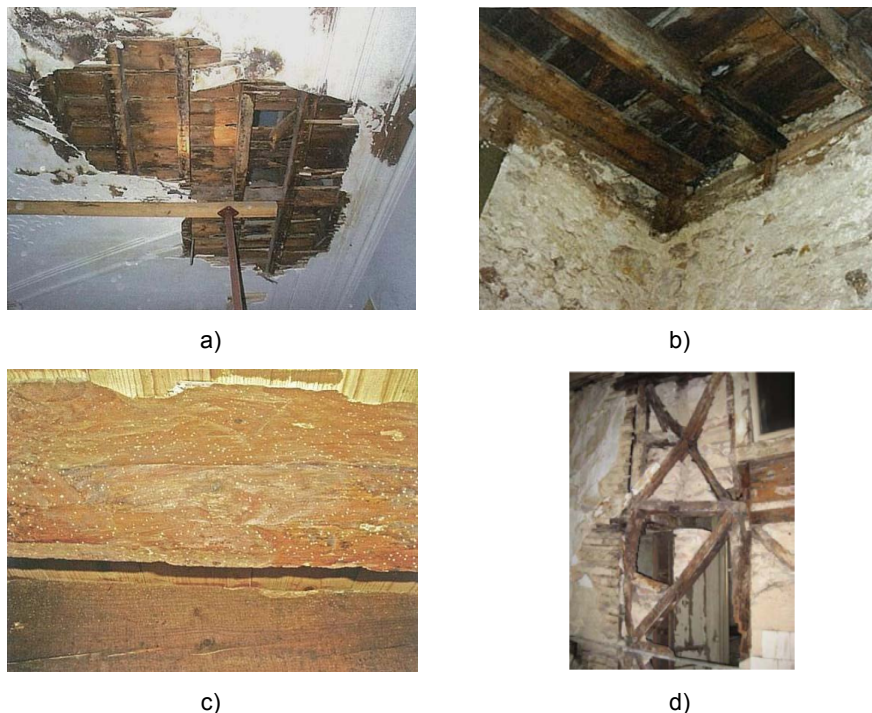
Example of wooden degradation: a) Excessive deformation of the floor (Paiva *et al.*, 2006); b) Decay of the floor beams (Silva, 2007); c) Timber beam attacked by worms (Paiva *et al.*, 2006); d) 'Frontal' wall with lack of joist due to timber rot (Pena, 2008).
